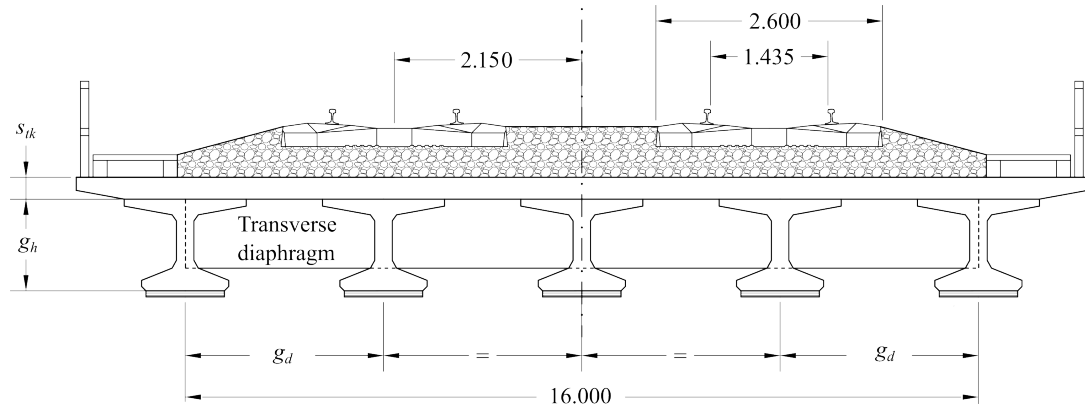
Arroyo Bracea I and Jabalón bridges cross-section.
